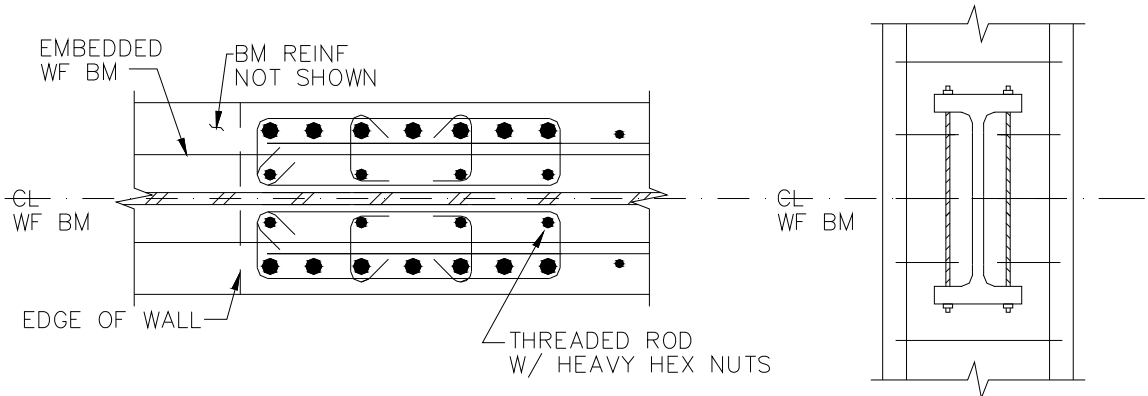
Threaded Rods and Conventional Hoops and Ties at Embedded Steel Section
